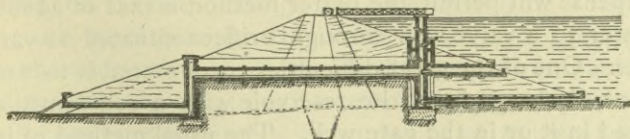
CROSS-SECTION OF EARTH DAM.
